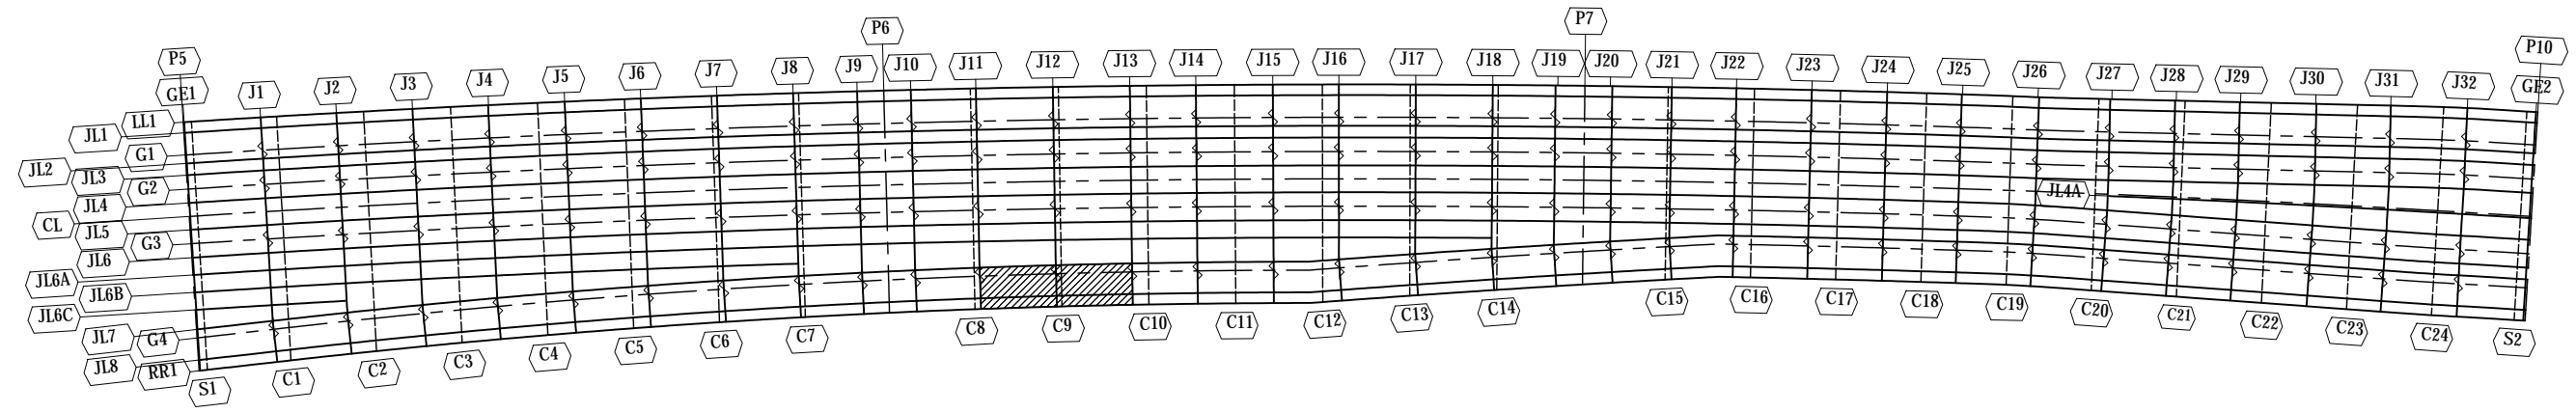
DETAIL OF DECK PLATE (78) S=1:60 (5-7)
